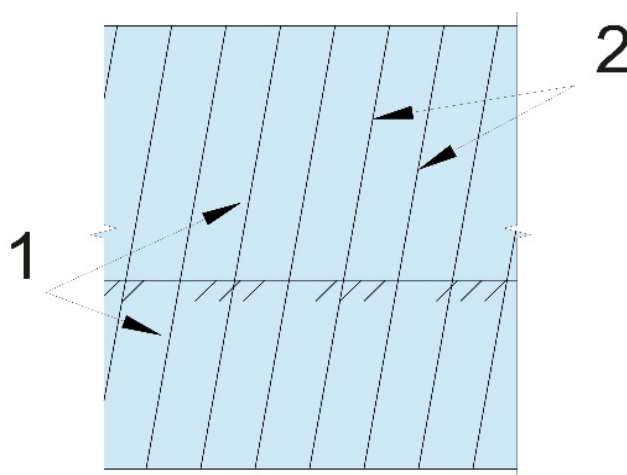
Fragment of longitudinal cross-section of the sheet pile wall.
